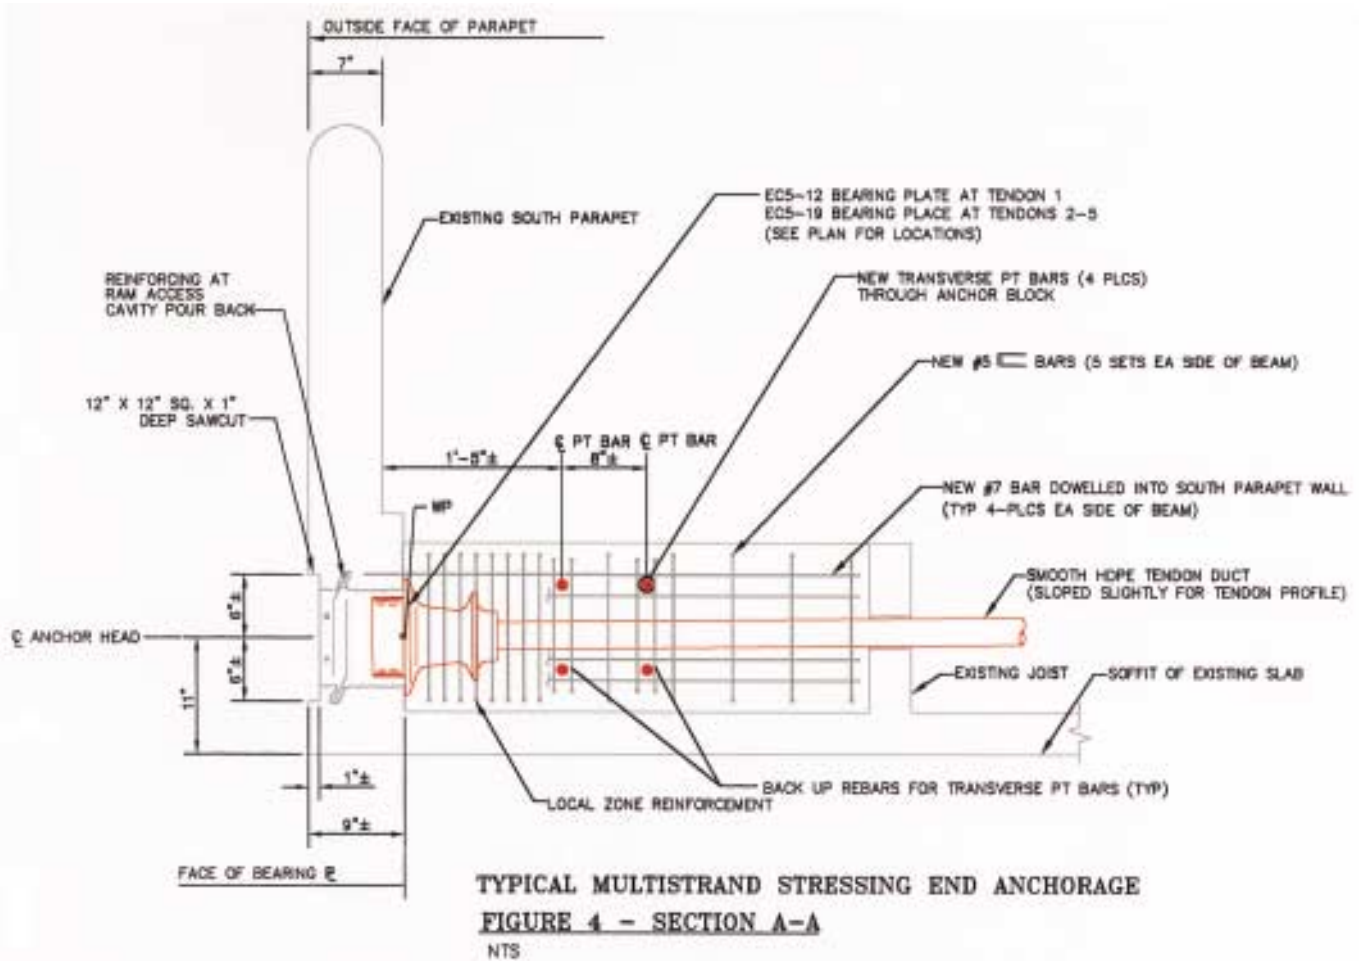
Typical reinforcement detail for a multistrand stressing end anchorage. Small openings were sawcut into the existing south parapet wall to gain access for stressing
